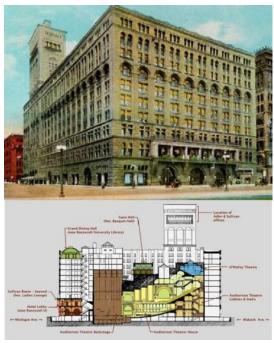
The Sullivan and Adler: Auditorium Building, Chicago, 1887- 1889
